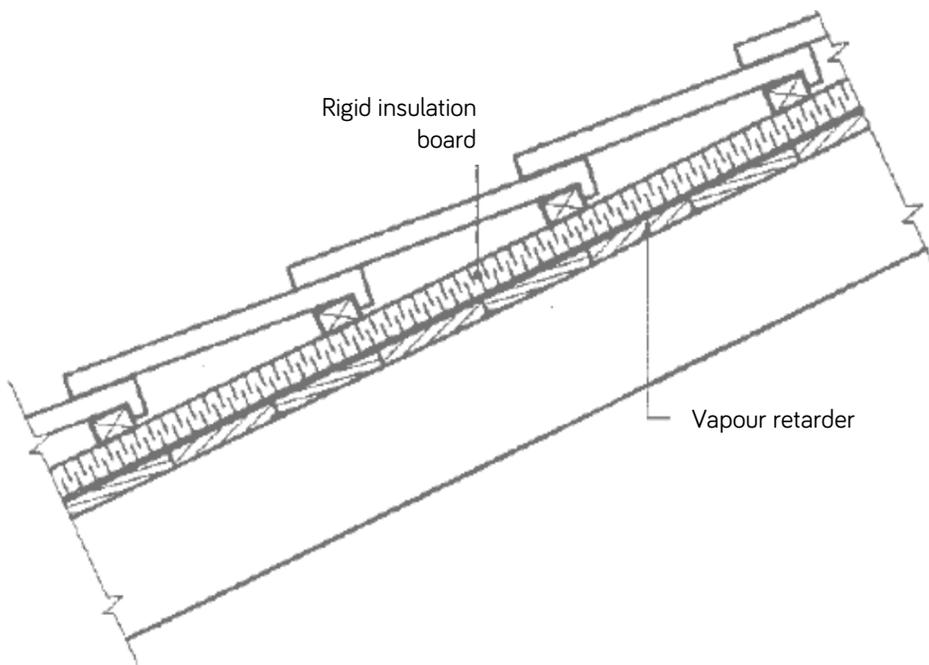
Rigid board insulation directly over ceiling lining / Insulation of sloping ceiling with pitched, tiles roofs.
